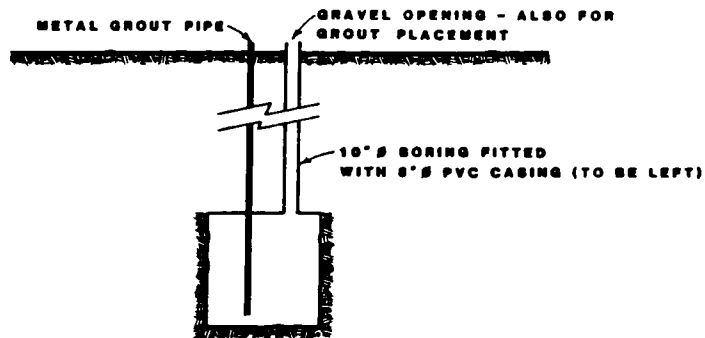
Cross section of grout plug installation and schematic of backfill operation.
